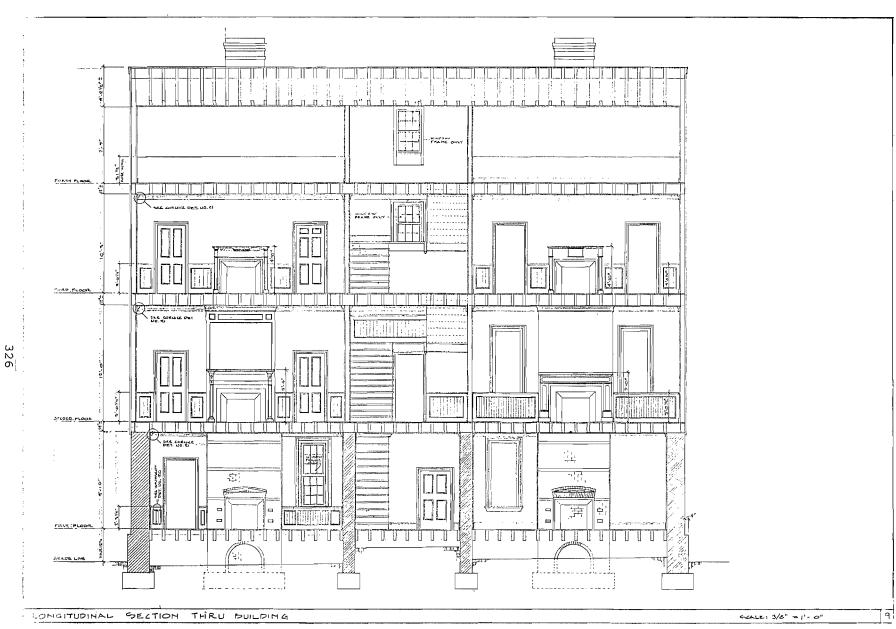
Longitudinal section through the Vanderhorst Mansion, adopted from plans developed by Robert Shoolbred Engineers.
